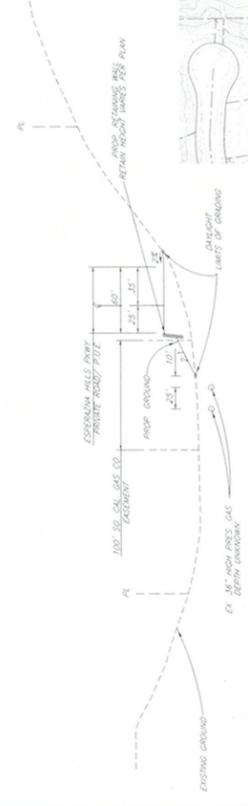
Conceptual Site Plan, Option 2A - San Antonio Road
